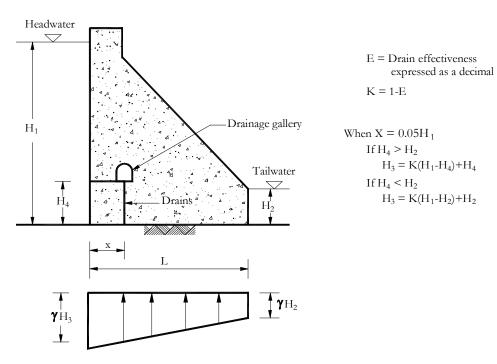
Uplift pressure with foundation drains near upstream face (USACE, 1995a)
